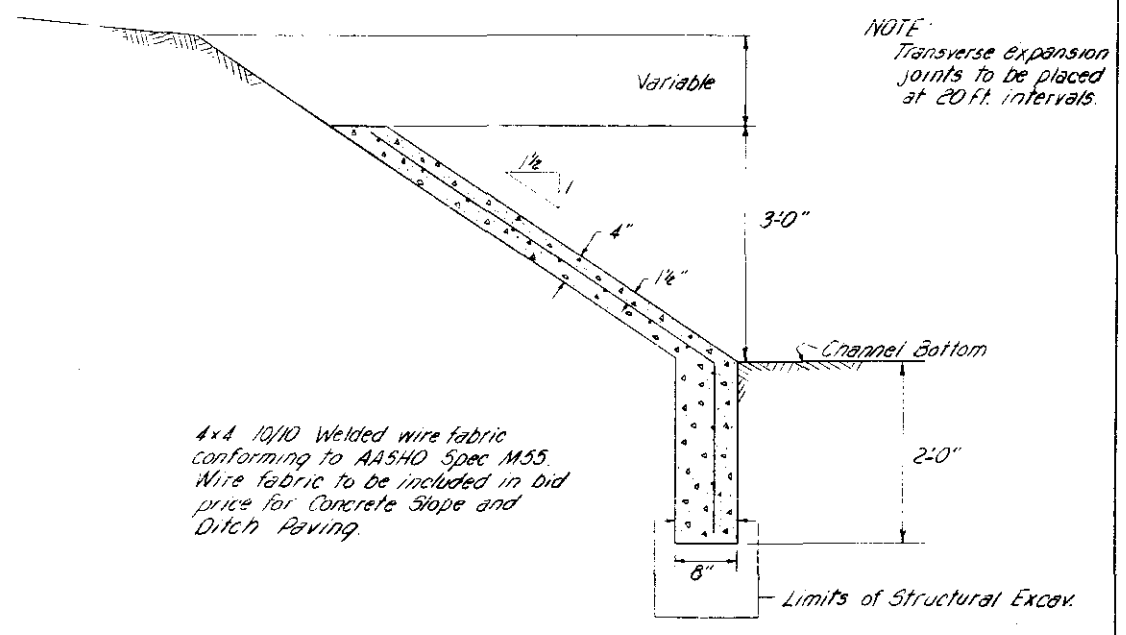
DETAIL OF CONCRETE SLOPE AND DITCH PAVING FOR CULVERT OUTLETS
